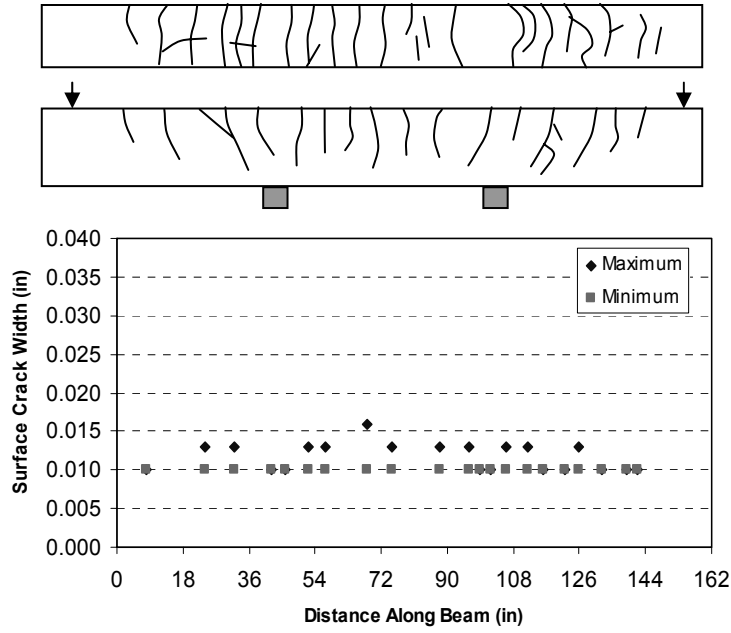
Final Crack Pattern and Measurements – Beam 4.2 <sup>6,7</sup>
